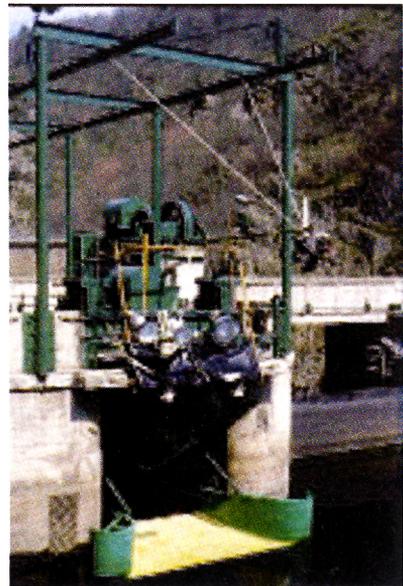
Surface bypass at the Poutes dam. Note the shape of the bypass entrance to create a gradually accelerating flow.
